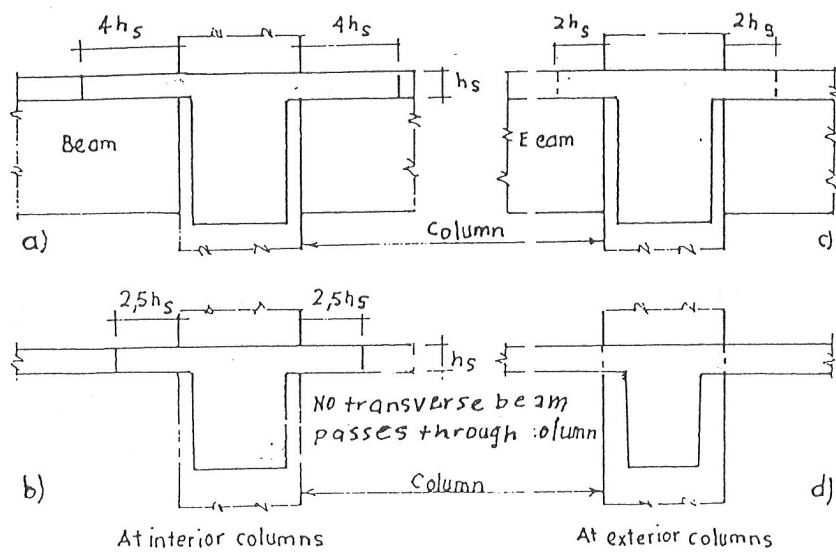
AREAS OF EFFECTIVE REINFORCEMENT
